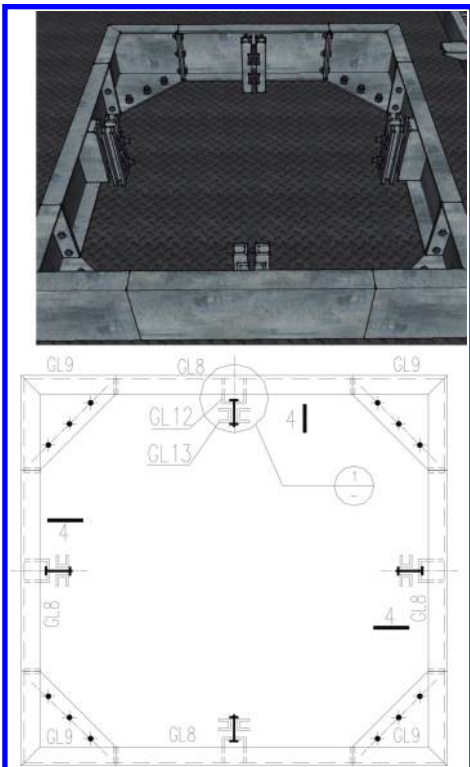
Three-dimension and plan drawing of the window mold conjunction.
